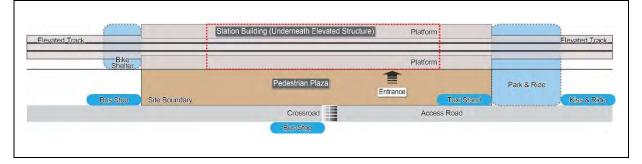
Prototype Site Plan of Elevated Type Medium Station
